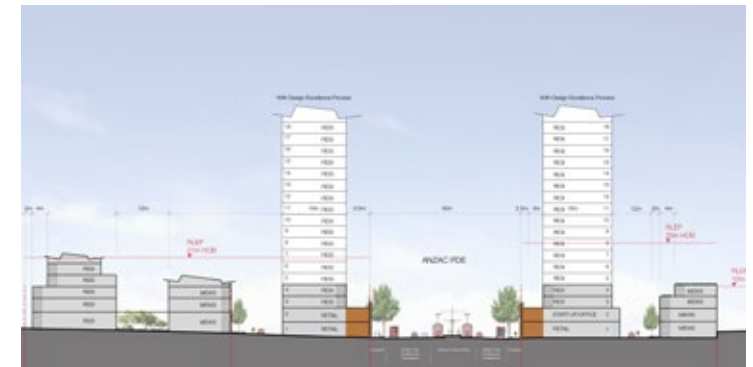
Section of Todman Square showing 18 storey building typology with four storey street wall and mews development at the rear.
